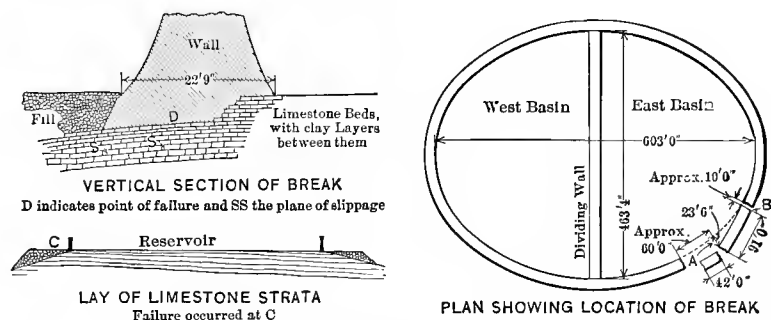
Plan and section of Nashville reservoir, showing cause of break. (After Purdue, Eng. Rec., LXVI, p. 539.)
